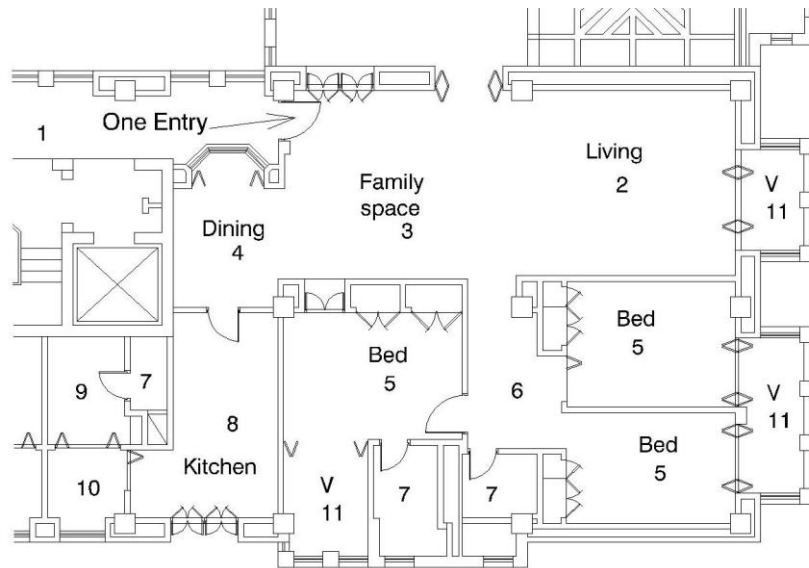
Plan with one entry, Dhanshiri, B. Haque
